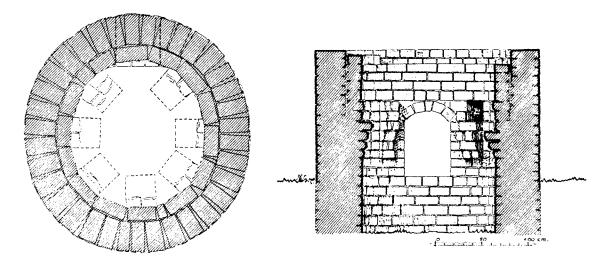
Lime Kiln. Ground Plan and Section. Scale, 1:40
